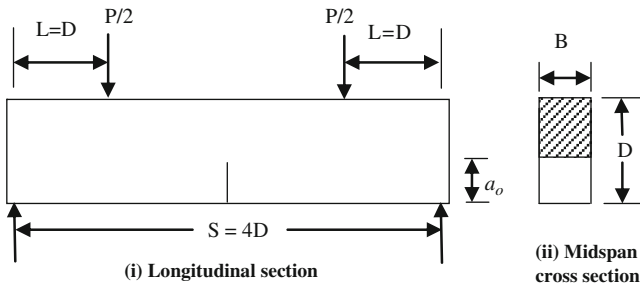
Dimensions and loading schemes of four-point bending test specimen
